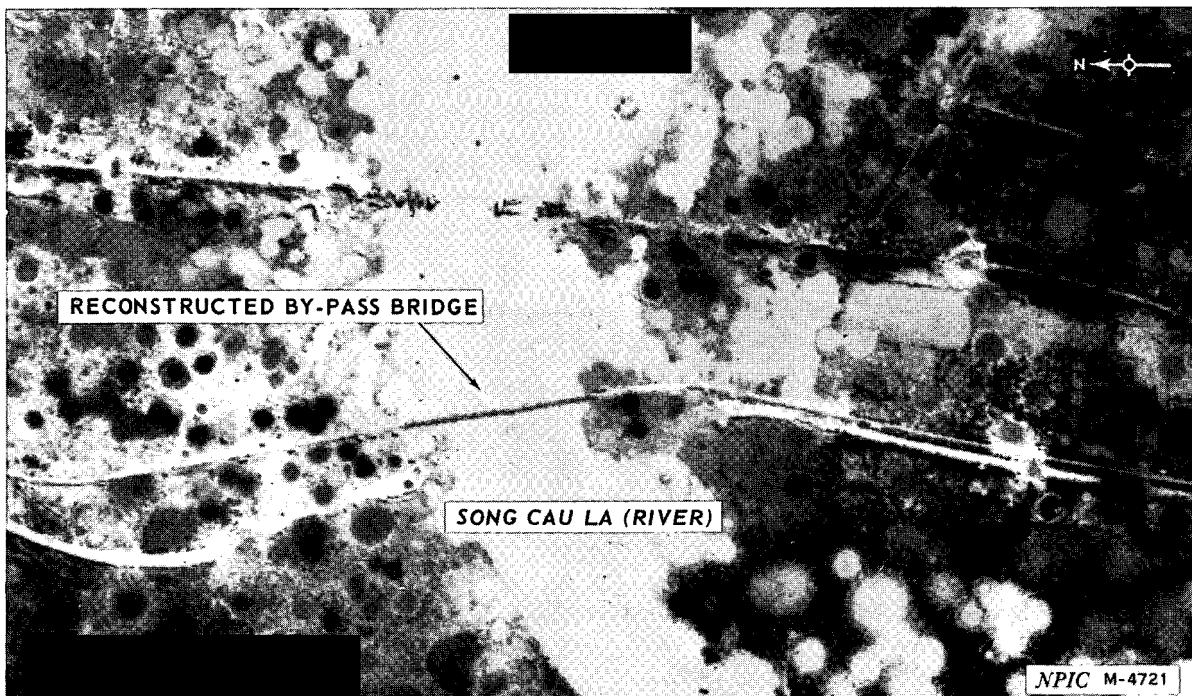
RECONSTRUCTION OF A RAIL BY-PASS BRIDGE, THANH HOA-VINH RAIL LINE, NORTH VIETNAM.
